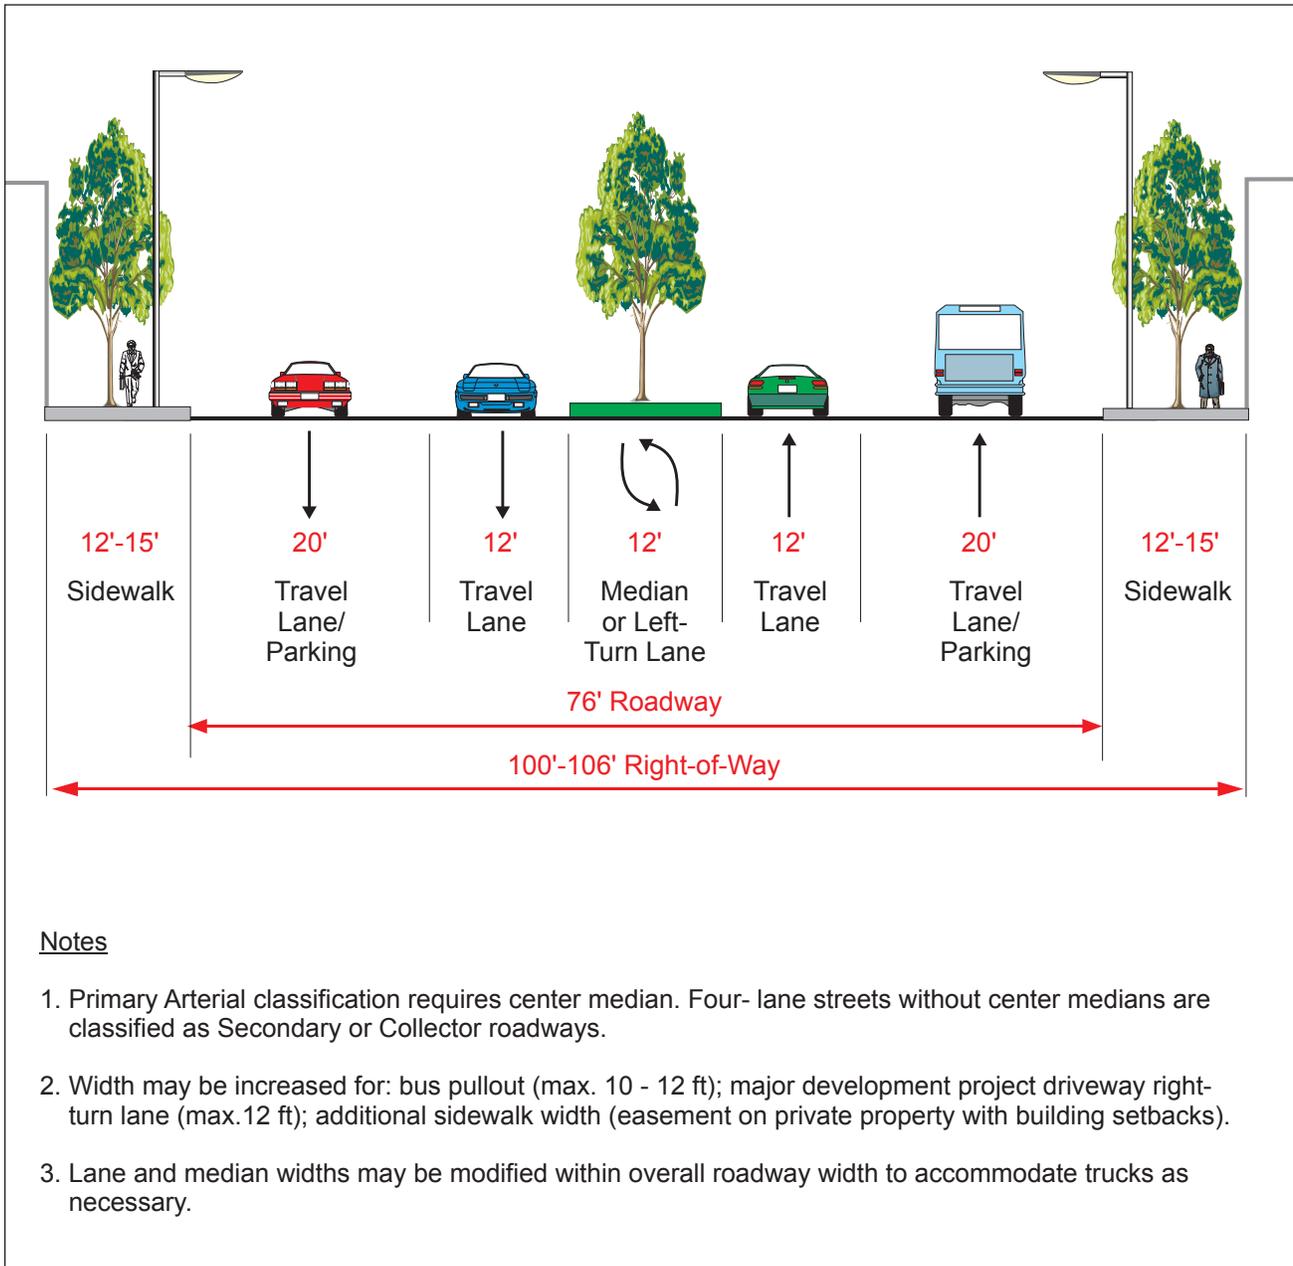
Street Standard Section for Boulevard (Primary Arterial) - 4 Lane - Intersection
